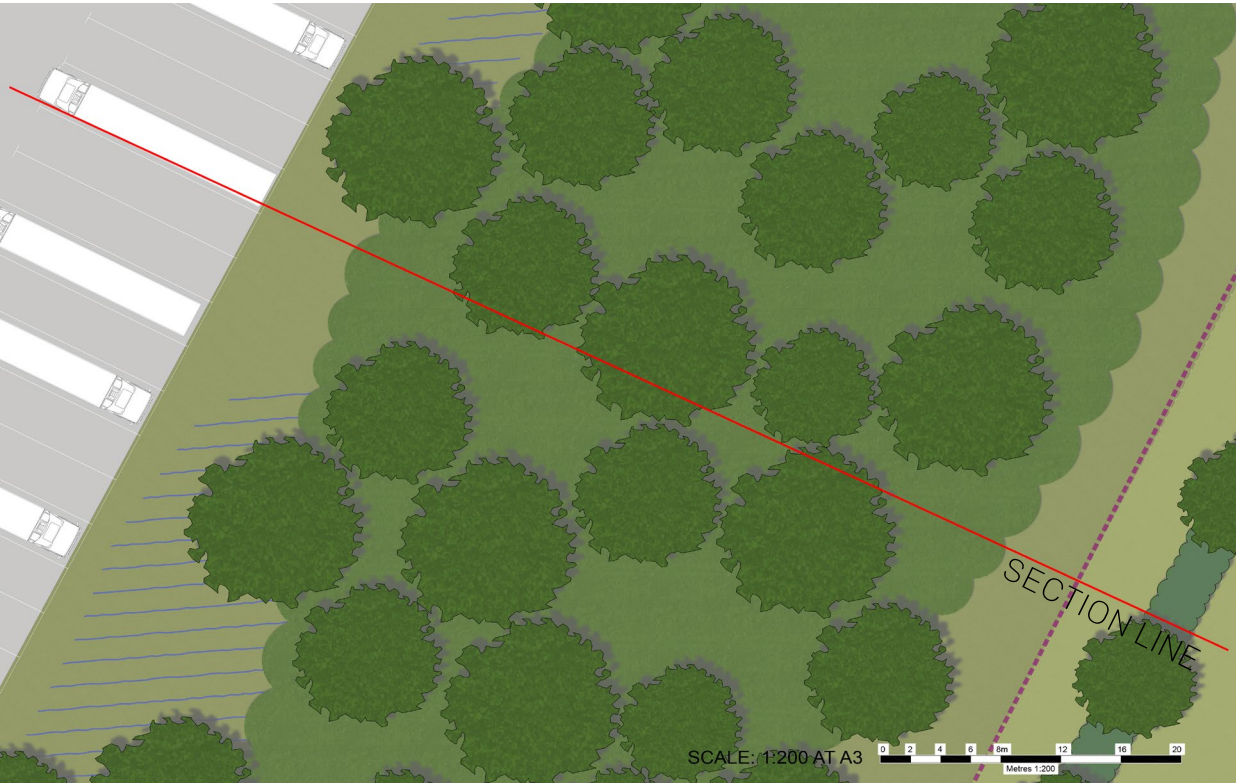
Illustrative Site Extract- Section Through Eastern Landscape Zone
